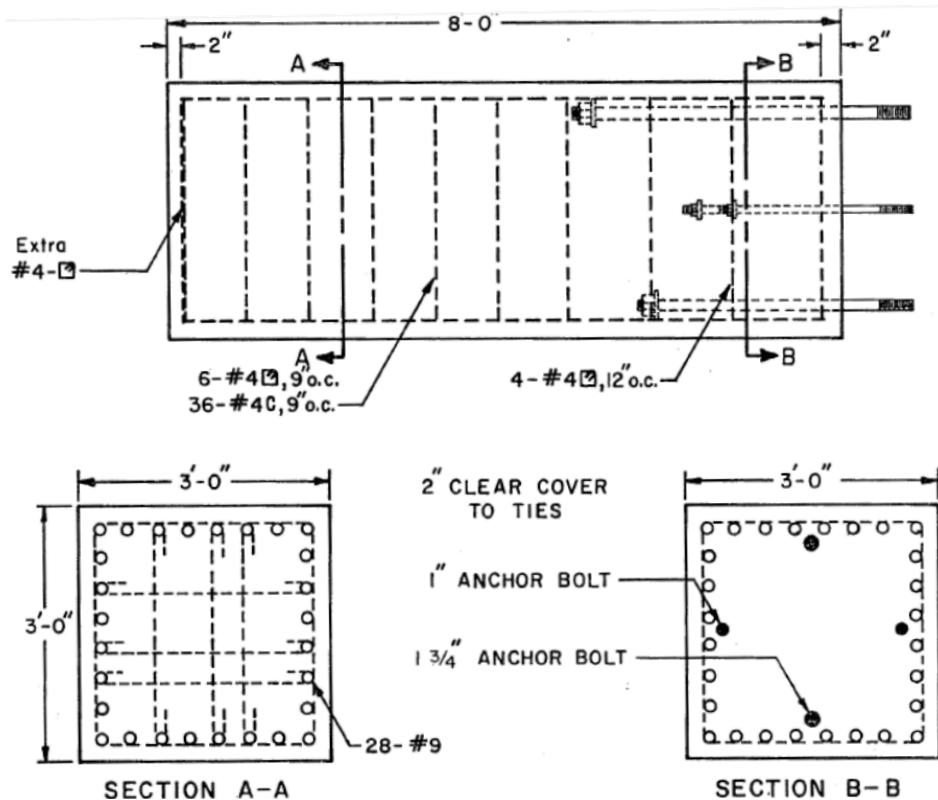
Typical test specimen in Hasselwander et al. (1977)
